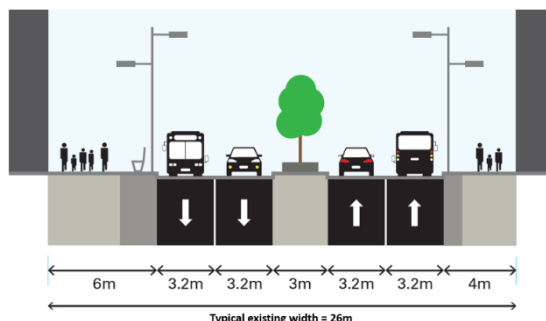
Typical Cross Section from College/Carlton Street to Gerrard Street
